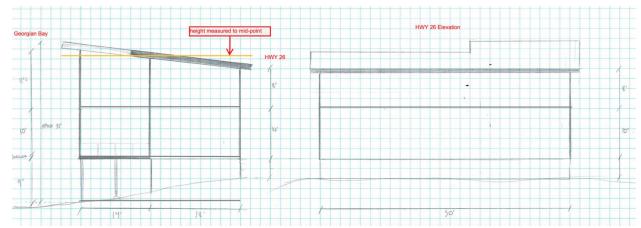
Applicant's Sketch of Building Elevation from Highway 26 and Georgian Bay
